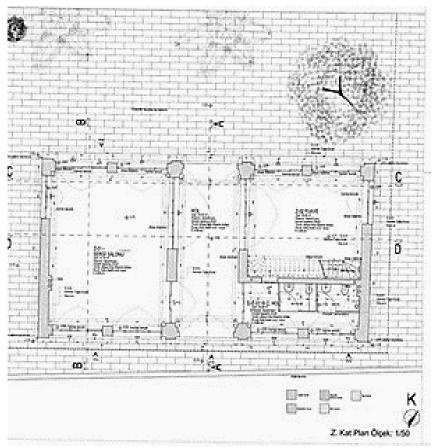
Ground Floor Plan (Restoration Project), [Bozdağ Architecture Company) [25]
